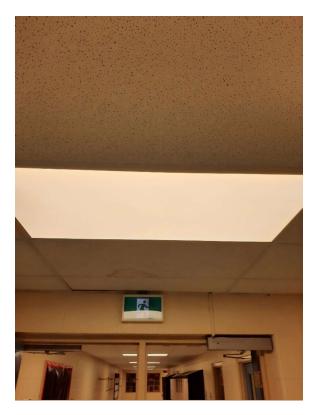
The 2'x4' random pinhole ceiling tiles observed in the second floor corridor have a manufacturing date of 06/17/23 and are not considered asbestos-containing.
